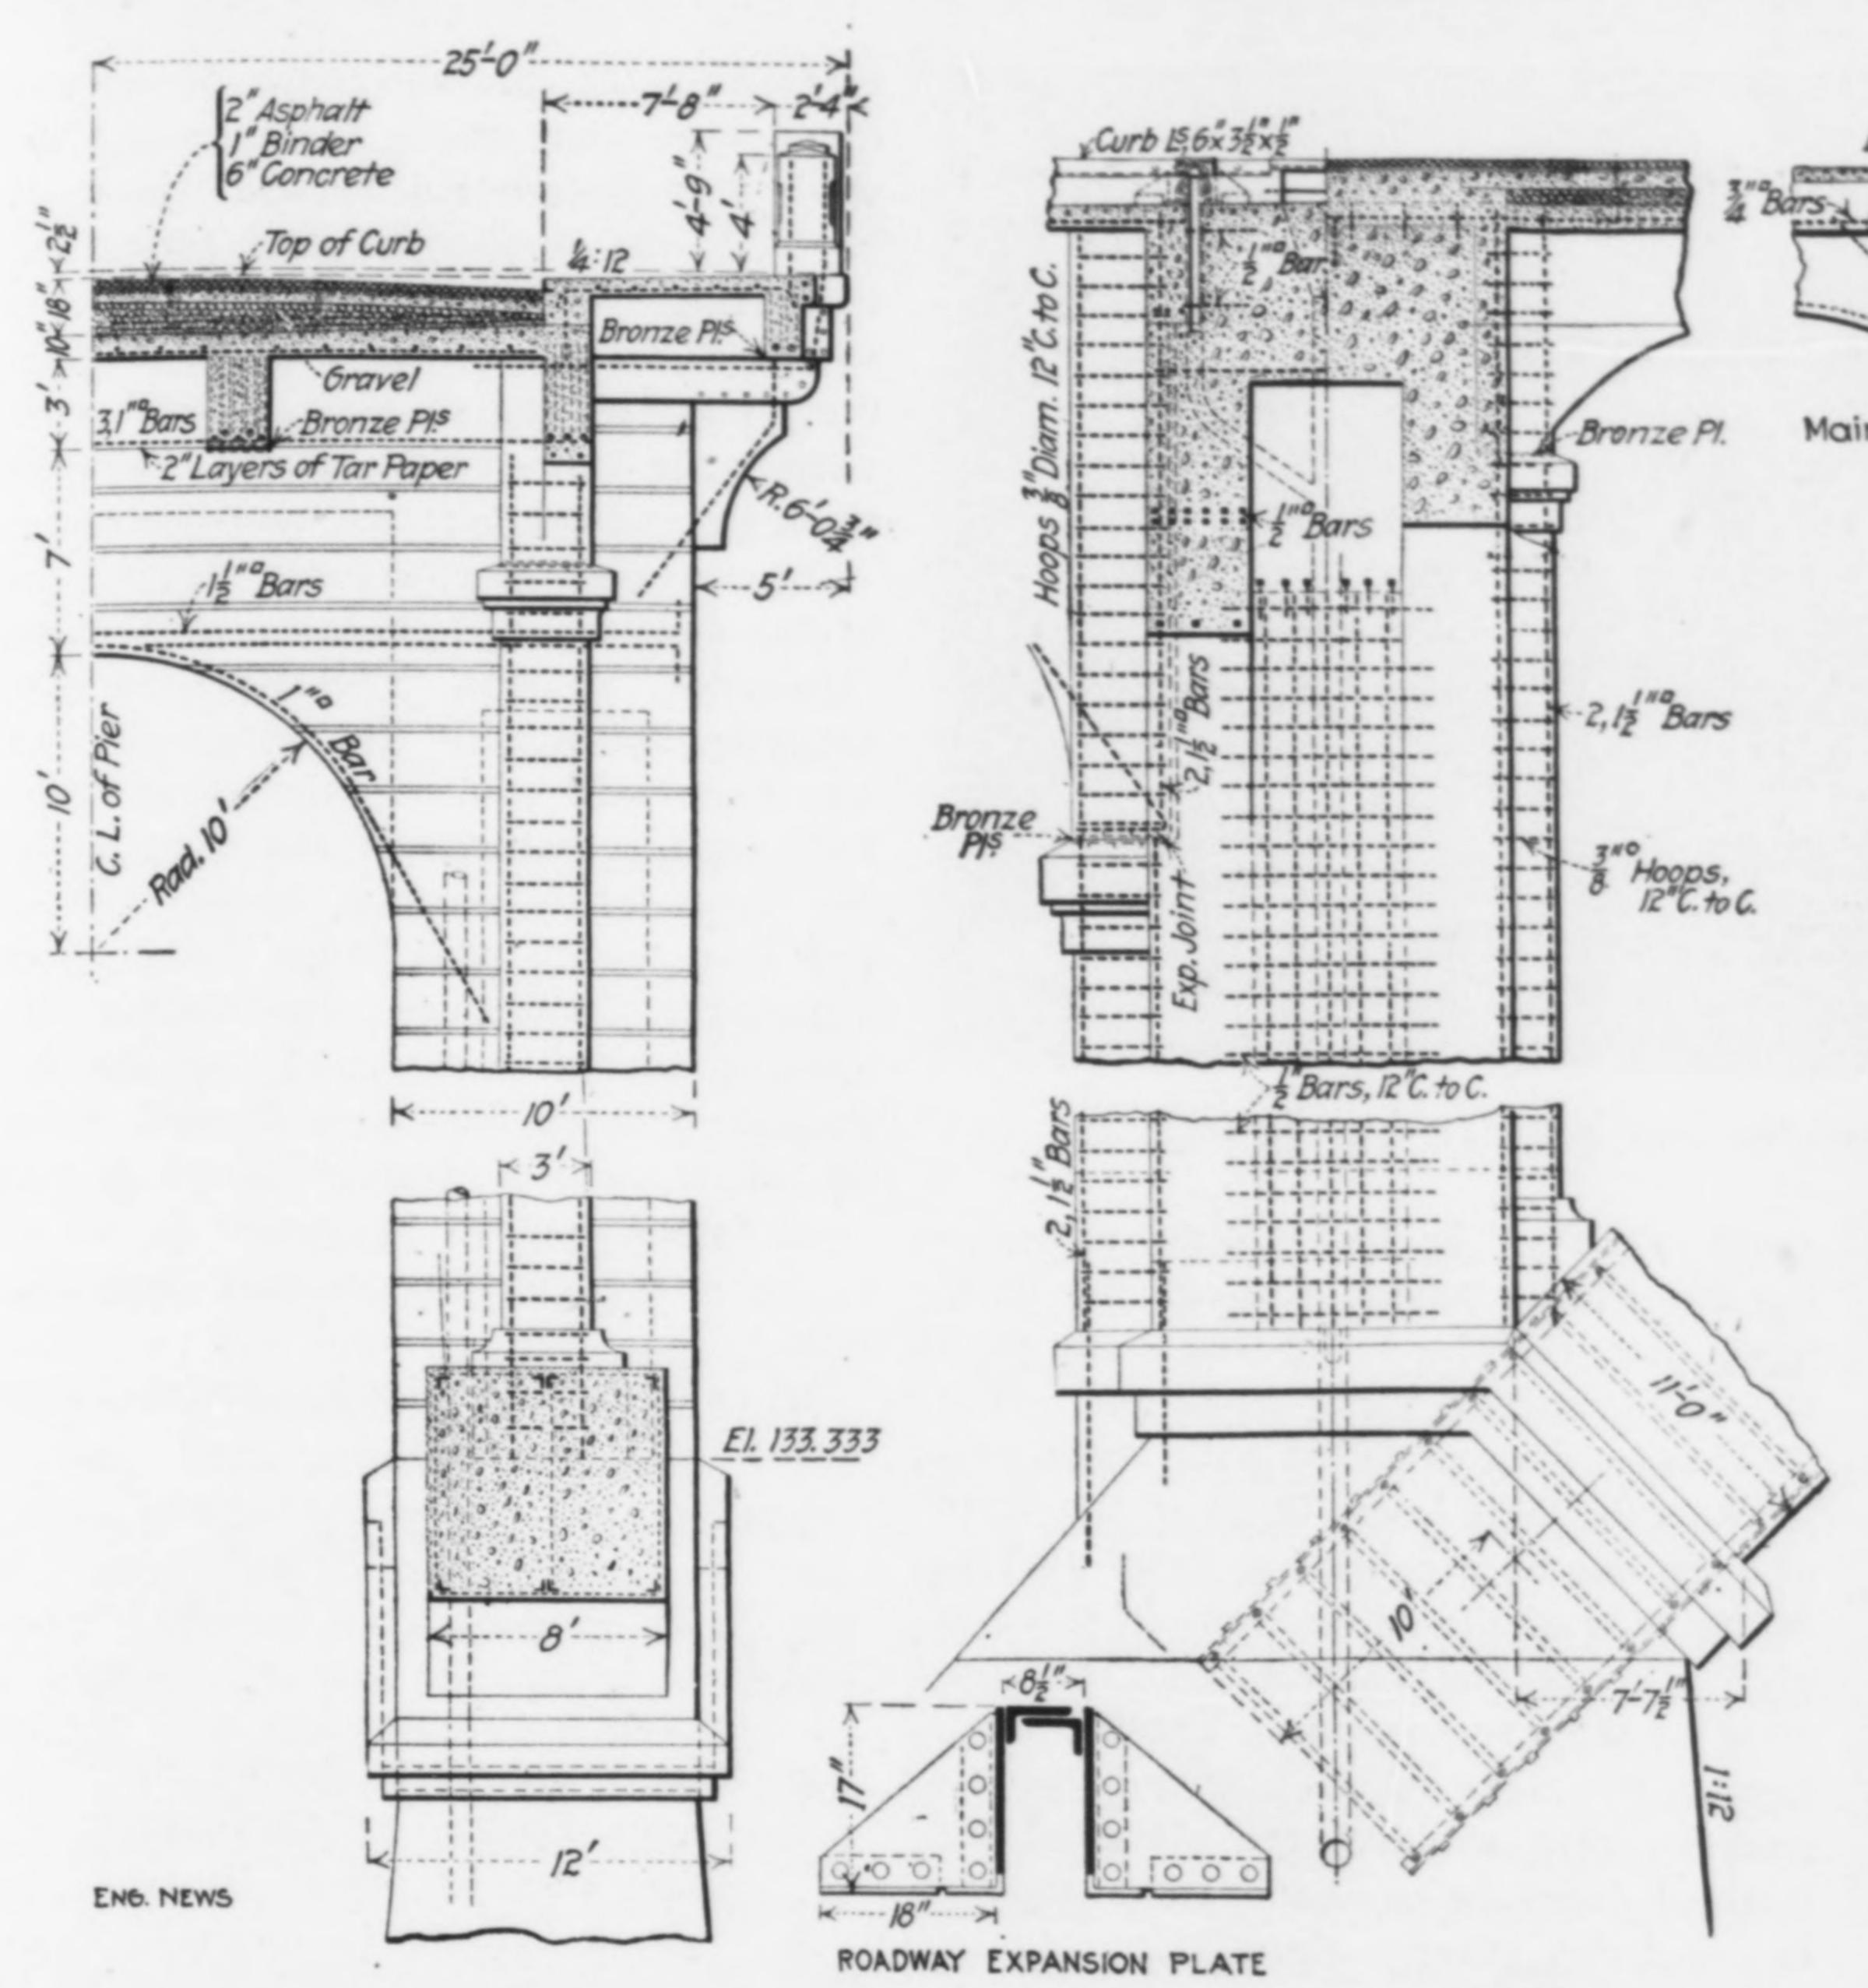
LARIMER AVE. ARCH: DETAIL AT MAIN PIER, AND EXPANSION JOINT IN FLOOR
